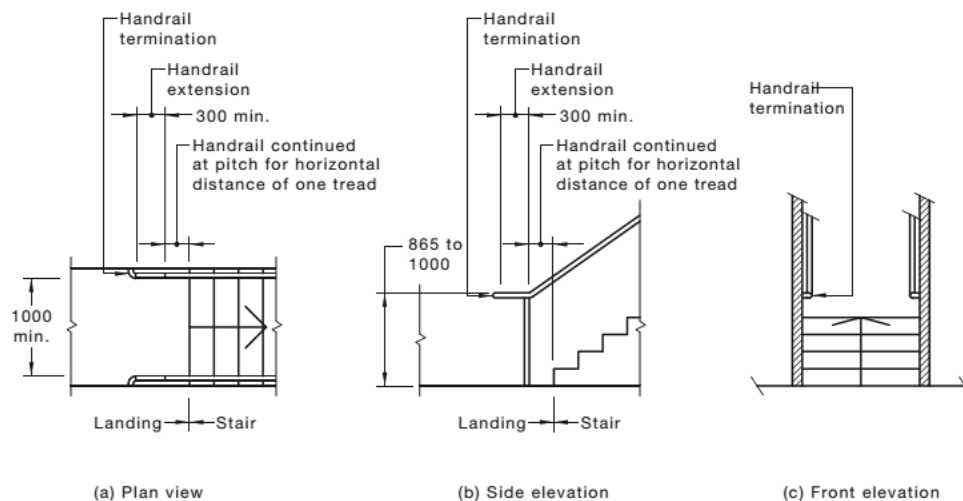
(C) STAIR HANDRAILS—HANDRAIL TERMINATIONS
